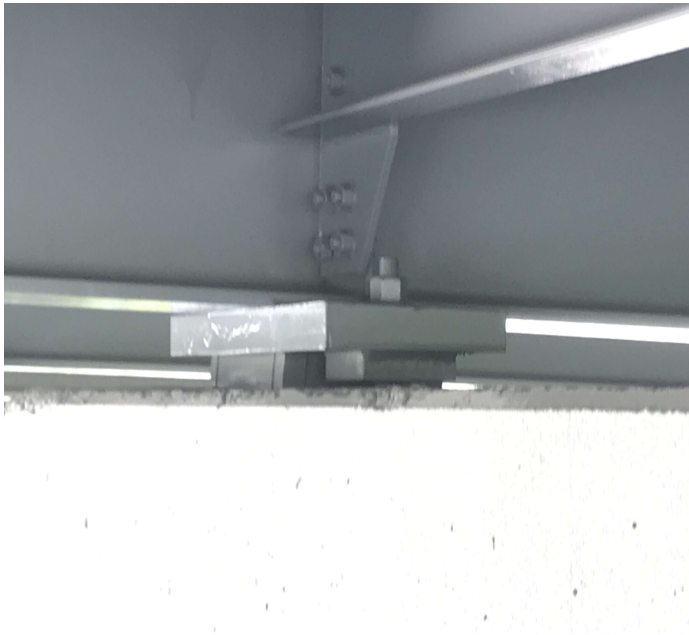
Description      Bent 2 between girders 5 & 6
